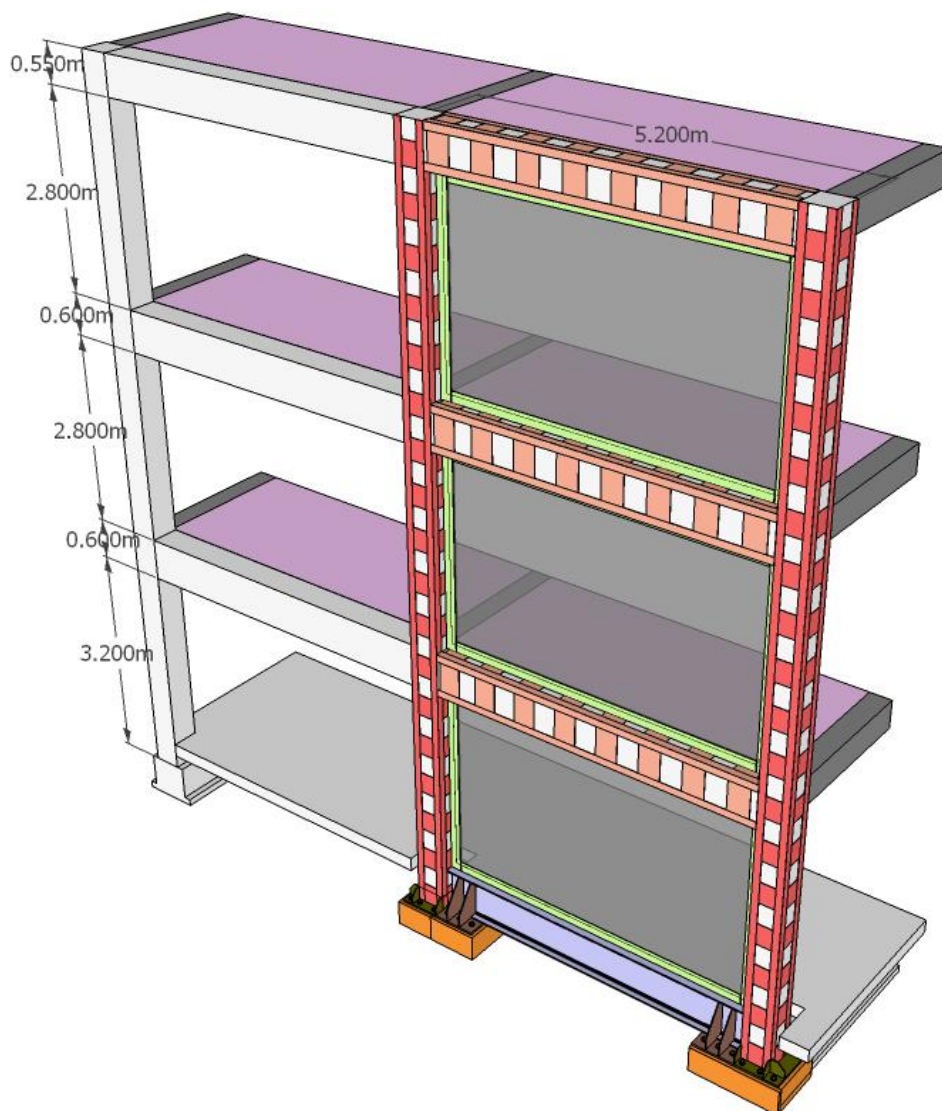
Isometric view of the proposed shear wall solution between the existing columns.
